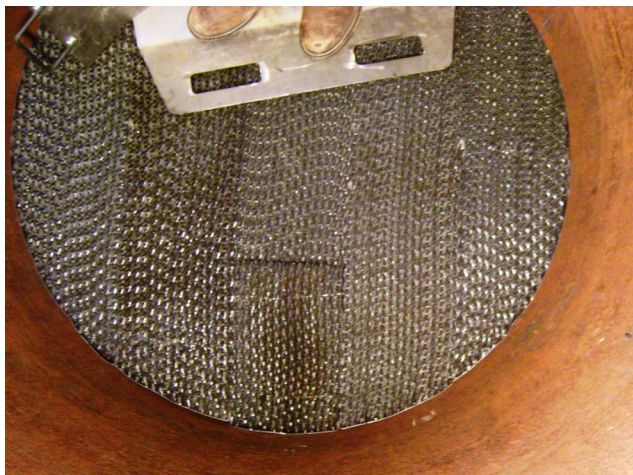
Metal Plate Used to Spread the Weight of the Installer
